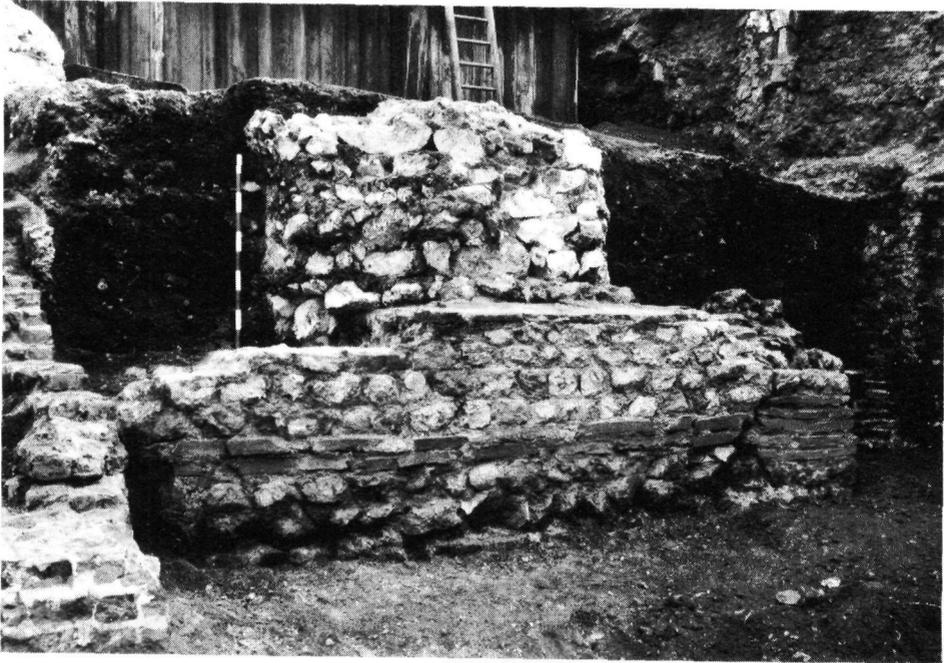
Roman *forum* at 160–2 Fenchurch Street: The outer wall of the S portico of the second *forum*, looking S. The pier above is part of the foundations of St. Dionys Backchurch.
